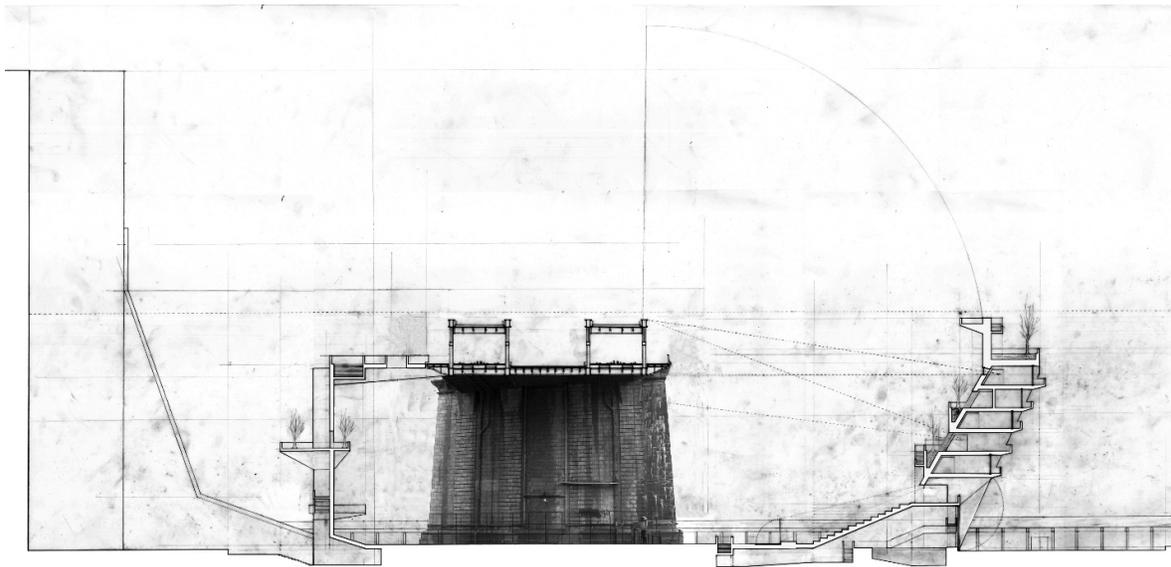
Cross section of Manhattan Bridge project showing "shell" buildings defining the space of the bridge.
